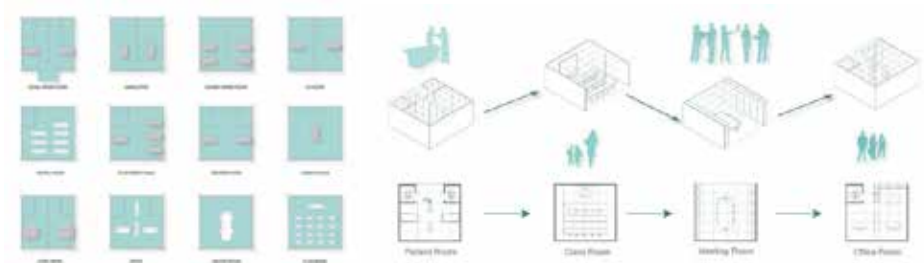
Possibilities of room layout modifications based on OR module. Source: (OPEN BUILDING group, 2016).
